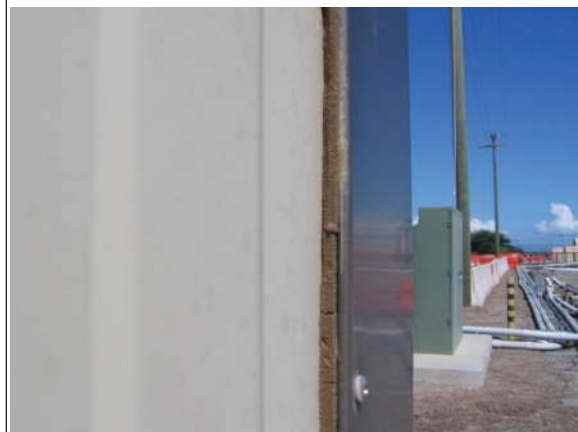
All exterior wall panels and aluminum trim intersections need to be re-caulked
